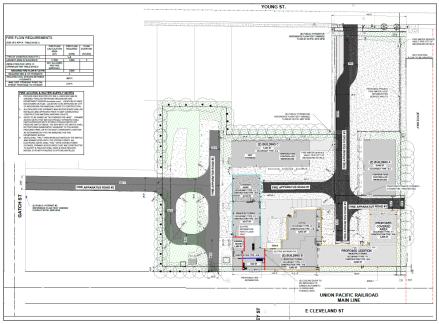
1 Sheet COO4 Fire apparatus roads
